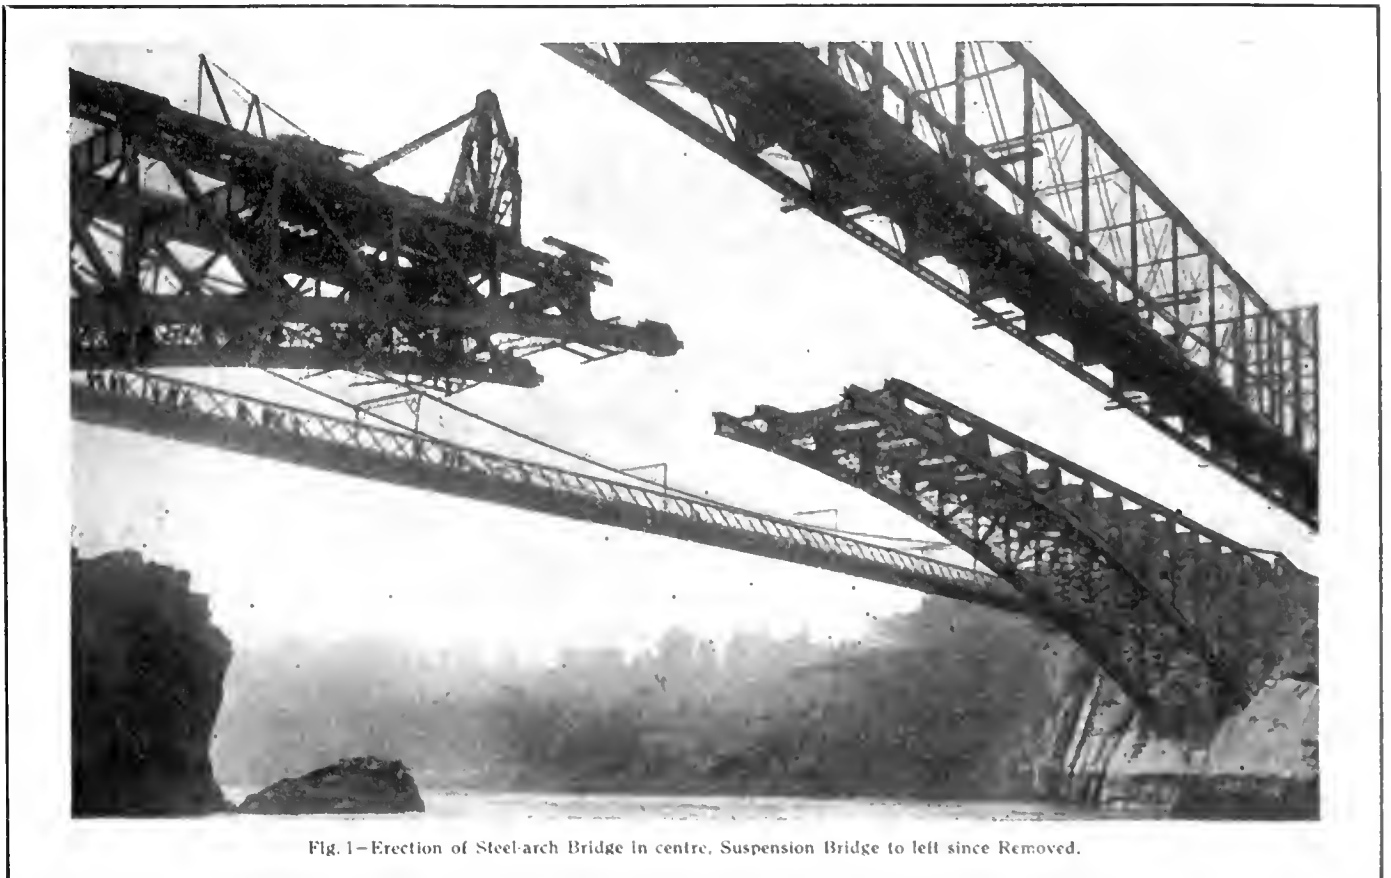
Erection of Steel-arch Bridge in centre, Suspension Bridge to left since Removed.
